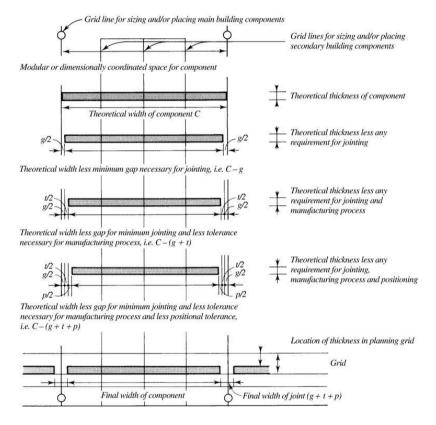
Tolerances allowed when designing components: a simplified method of arriving at the 'final dimension' of a component. More accurate but more complicated calculations
